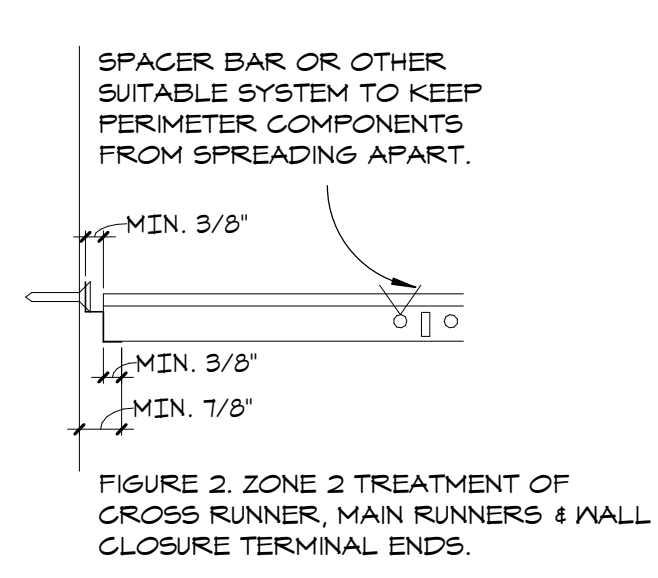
ZONE 2 TREATMENT OF CROSS RUNNER, MAIN RUNNERS & WALL CLOSURE TERMINAL ENDS.
